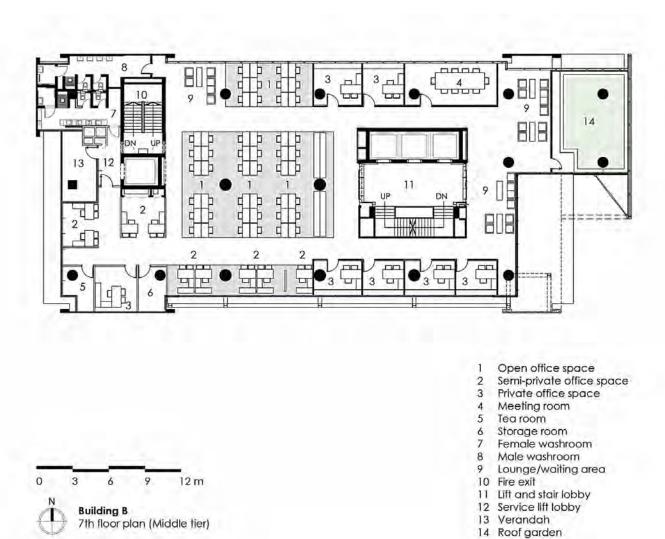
Floor plan of Building B: Middle tier (Source: Building B interior designers, edited by author)
